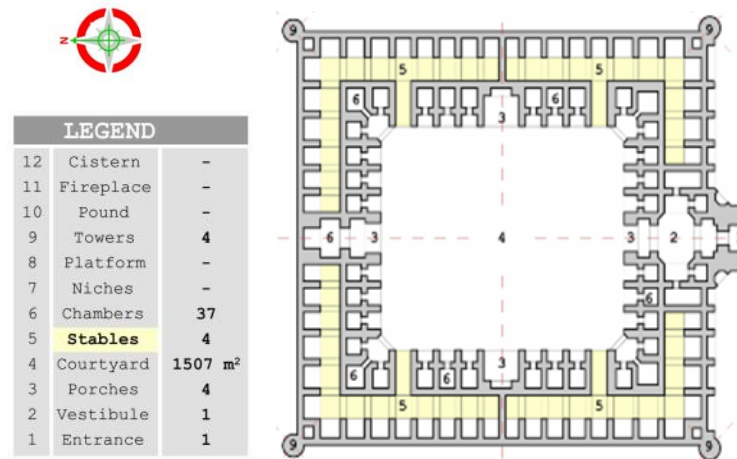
Safavid Laleh International Hotel (Abbasi cavanserai) , The original plan and the schematic plan with 6000 square meters, four-porch form, 20 standard rooms, Iran, Kermanshah, Bistoon (URL12).
